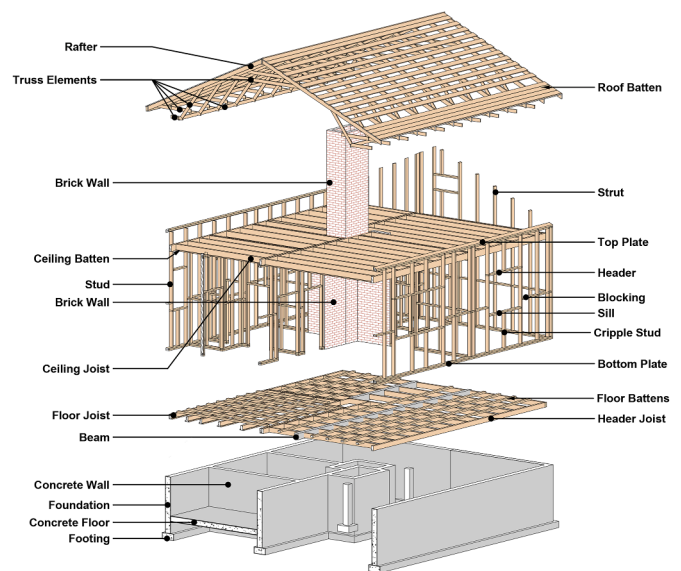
Building materials and building-elements included in MIs for balloon framing and prefabricated houses.
